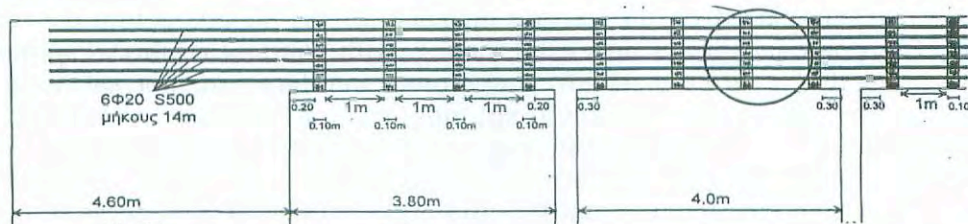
Collector element for concrete walls of Fig. 5-35, fastened to side of perimeter beams.
